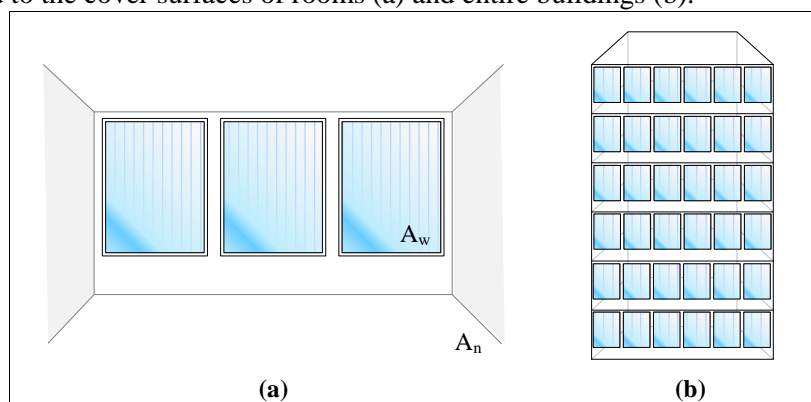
proportions of window area in single rooms (a) and in multi-story buildings (b)
